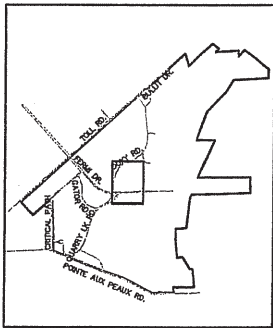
B CONSTRUCTION AREA 5 SECTION DETAILS
